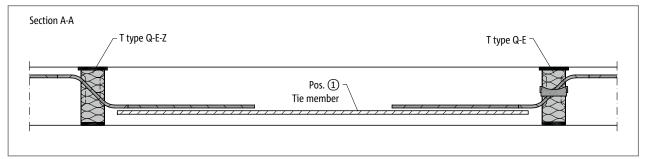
Schöck Isokorb® T type Q-E, Q-E-Z: Section A-A; one-way reinforced concrete slab
